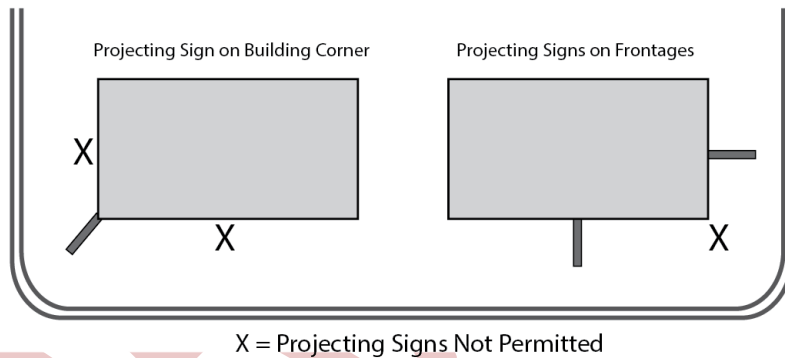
Projecting Sign Building Corner Placement Restrictions
